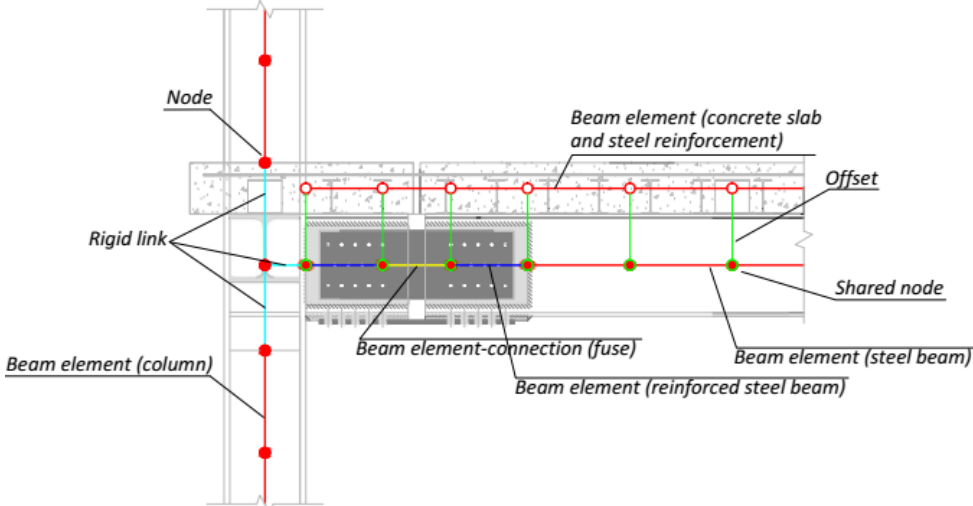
Numerical modeling of composite steel-concrete beam joints with fuse devices
